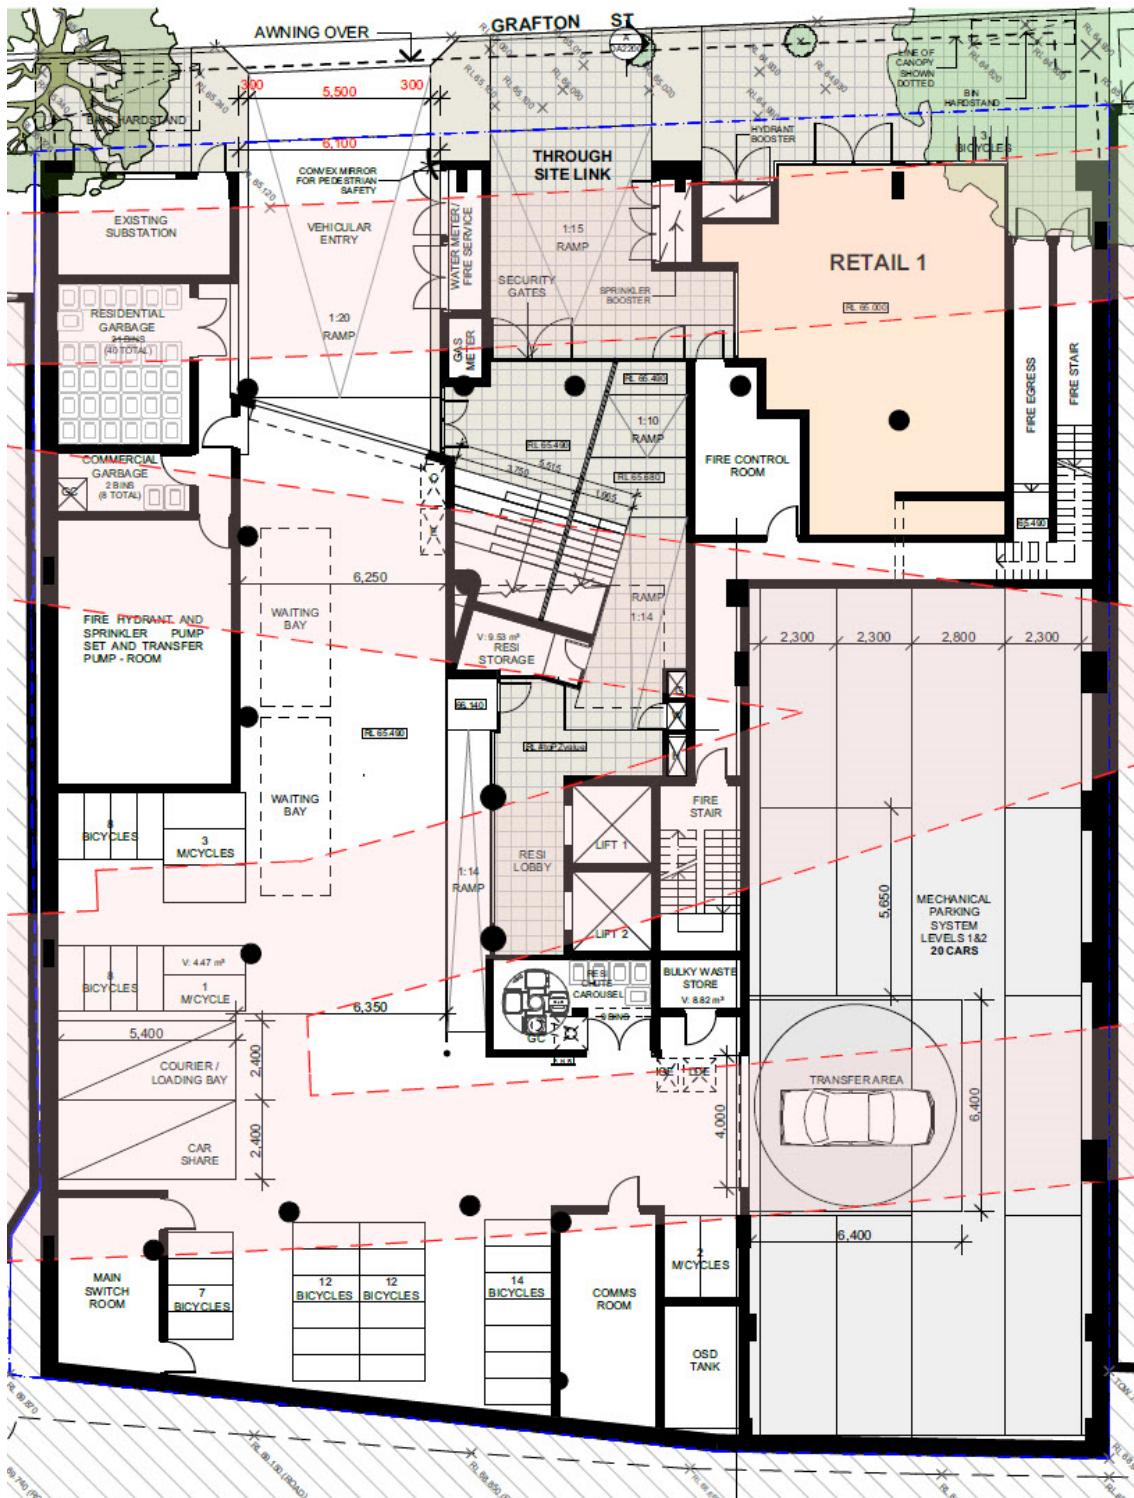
Original Lower Ground Floor Plan (Source: Cottee Parker JPRA, DA 2100_A)
